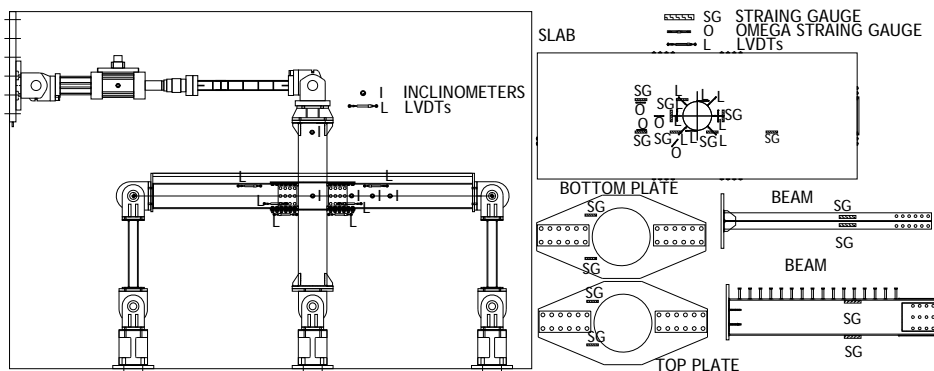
Lateral view of the test set-up and main instrumentation on specimens.
